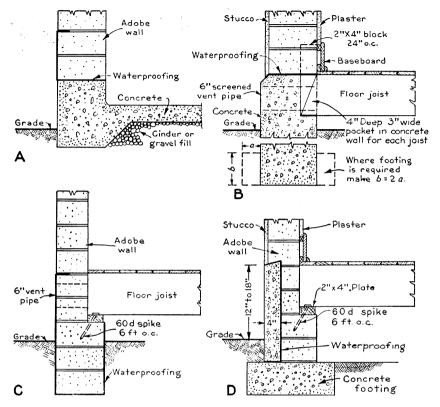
A, Shallow footing suitable for dry climates, where it will not be subject to undermining by surface drainage. Outside waterproof protection is provided for walls that are not stuccoed, and an inside curb to keep the earth dry when the floor is cleaned with water. B, Suggested footing for thick walls. It provides full bearing for the adobe wall and protects the outer part from erosion. C, Adobe foundations for minor structures are afforded a fair measure of protection from ground moisture in dry climates by heavily coating the bottom of the trench and both sides of the bricks with tar. The excavation must be made wide enough to permit application of the tar to the wall surfaces. The walls and trench bottoms could be plastered to advantage with 1 inch of 1:2½ cement mortar. D, Method of repairing walls eroded near the grade line. The adobe bricks are cut back 4 inches and replaced with a concrete base extending below, and at least 12 inches above, the grade.
